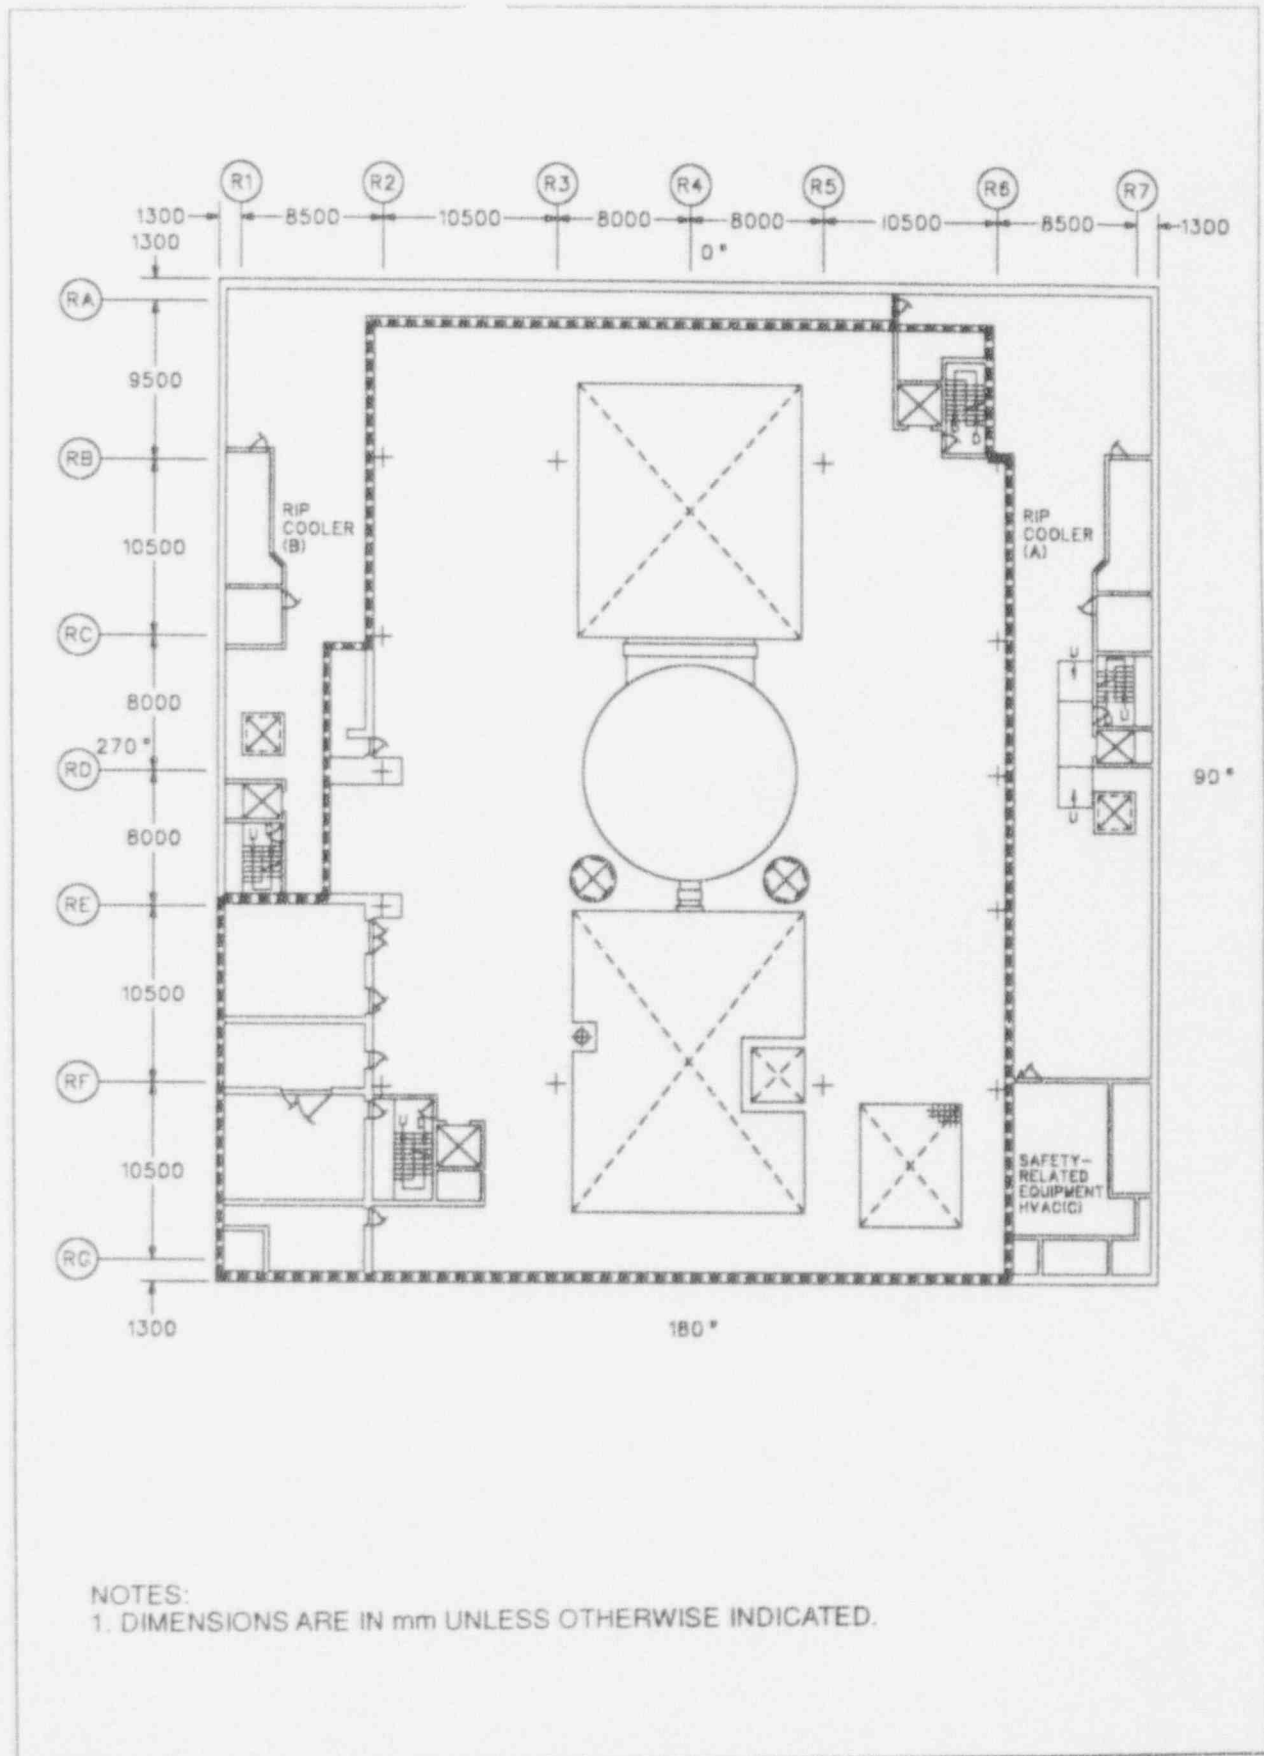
Reactor Building Arrangement Floor 4F—Elevation 31700 mm
